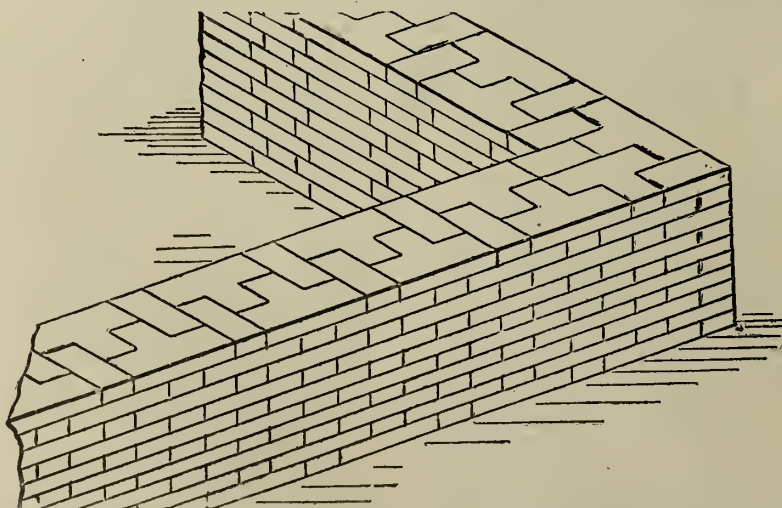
CHECKER FACE, 13-IN. WALL, COMMON BRICK ON CORNERS.
